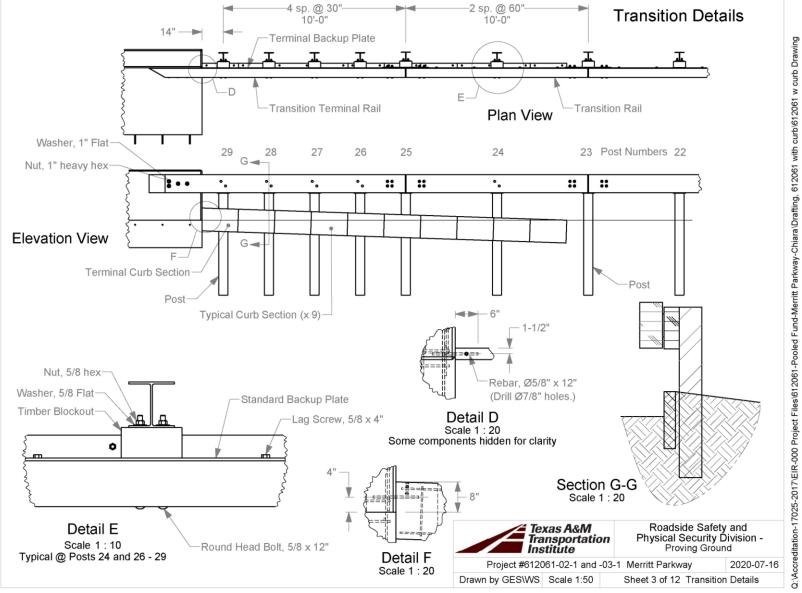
Merritt Parkway Guiderail Transition Details.
